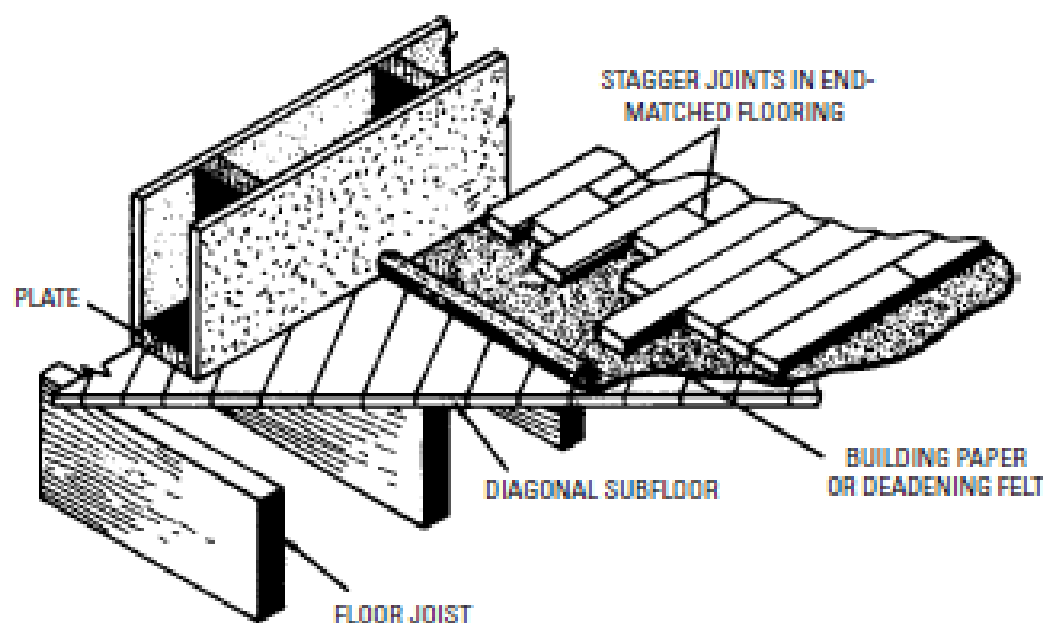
Application of strip flooring showing the use of deadening felt or heavy building paper.
